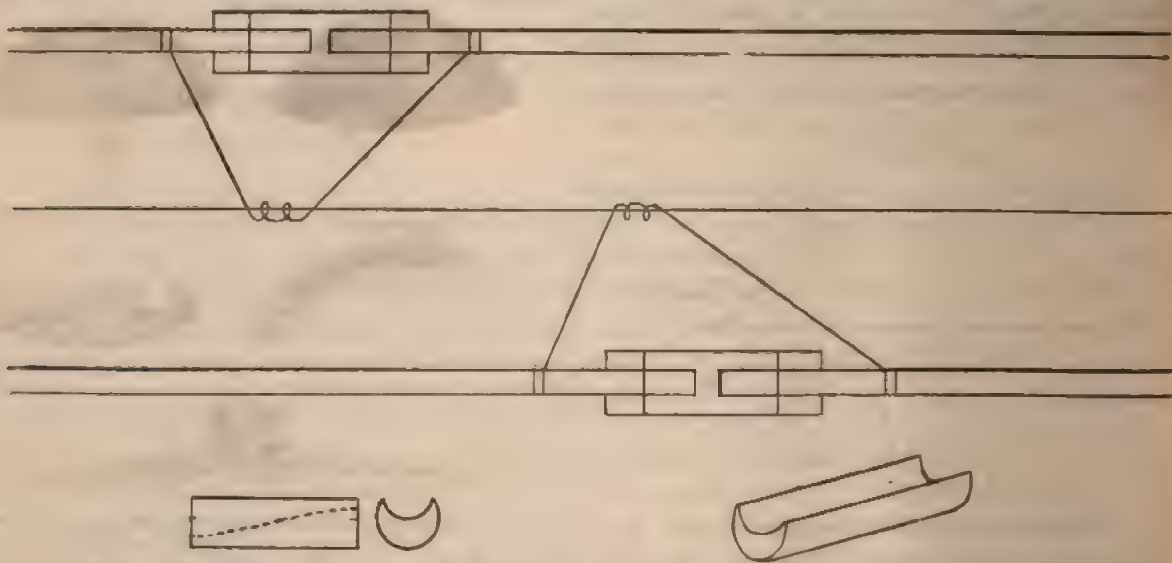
Plan of Rails Showing Connections (Thomson-Houston System).
